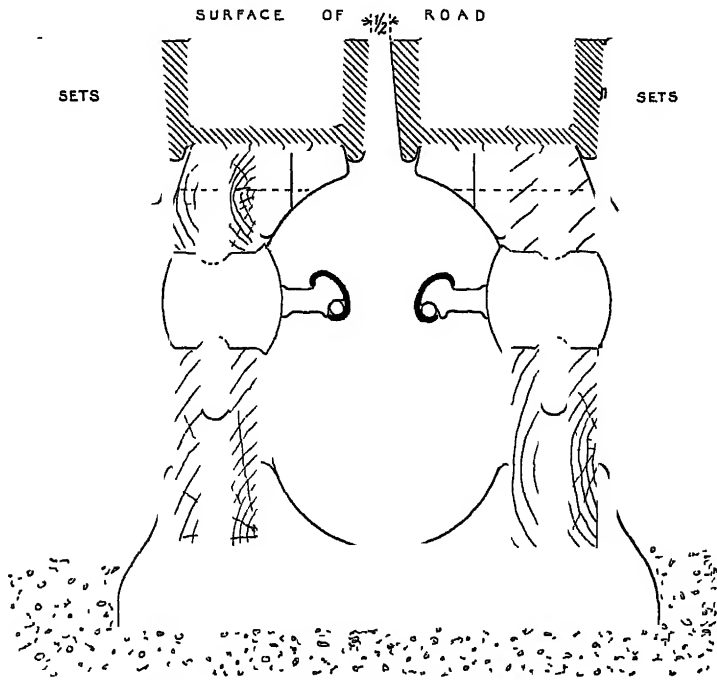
Transverse Section of Conduit, Blackpool Electric Railway
